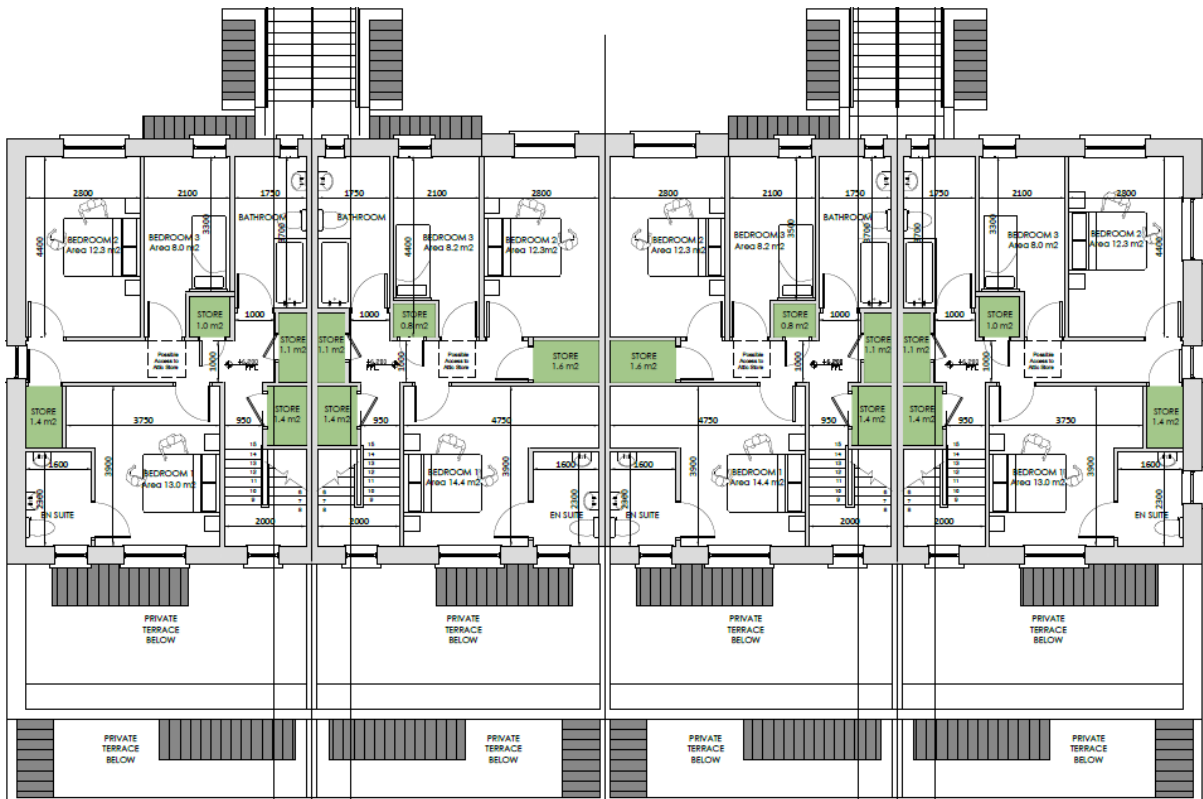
Proposed second floor plan of Duplex Apartment Blocks A, E, H, I & K.
